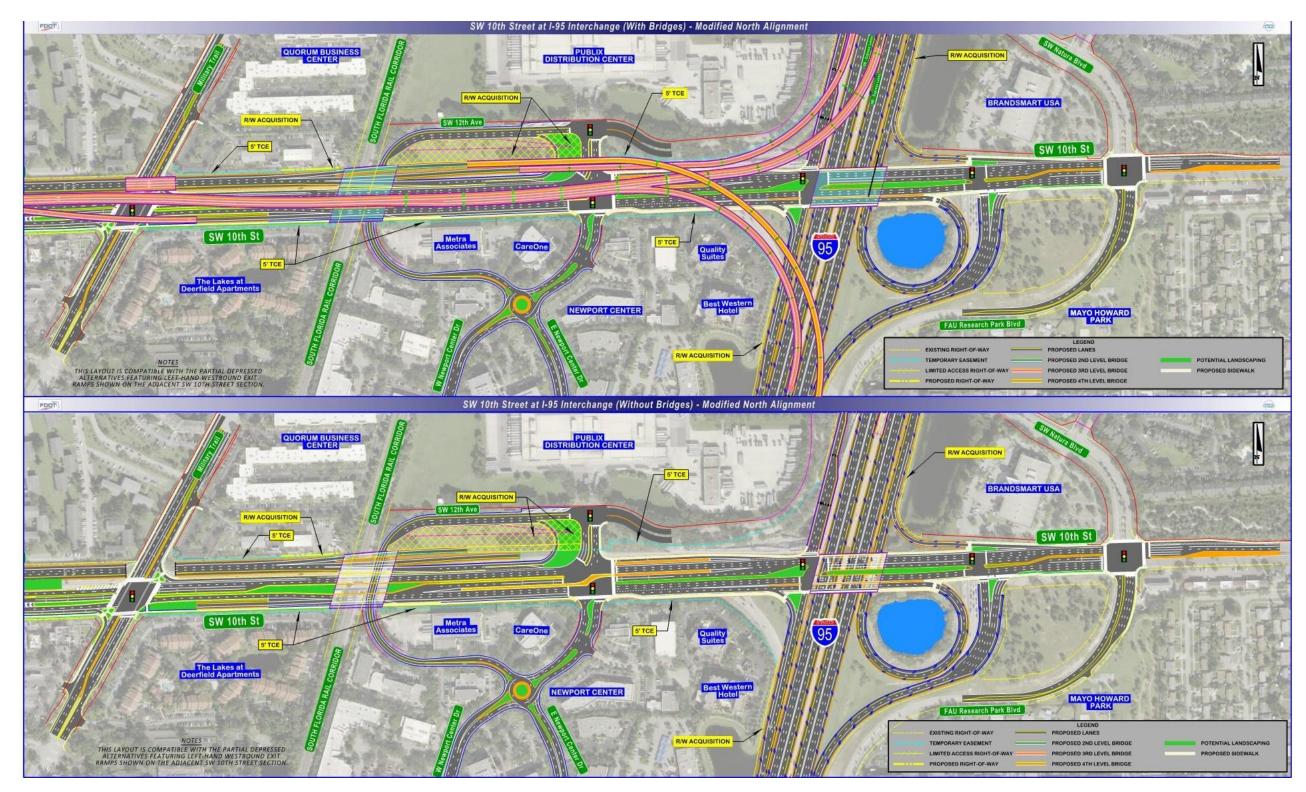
SW 10 Street – Modified North Alignment Concept Plan
